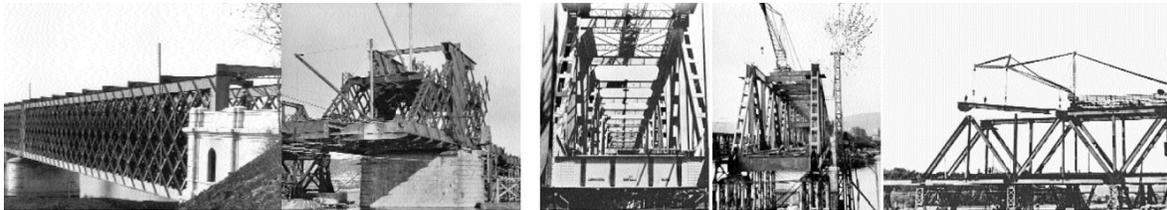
(a) Photo left: First iron bridge and demolition 1881 – (b) Photo right: Second metal truss structure, construction 1950
